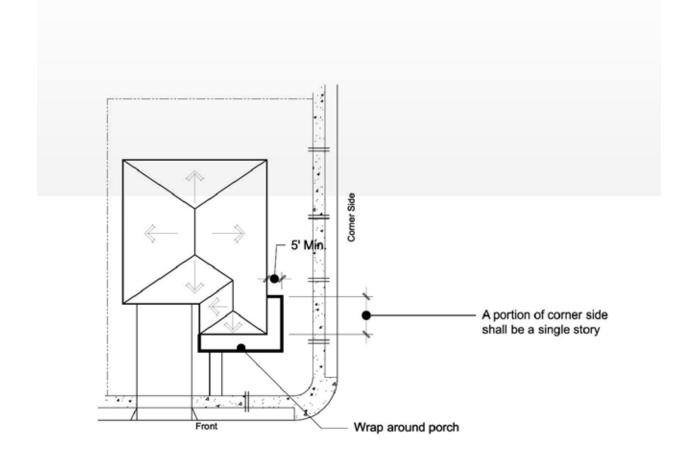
CORNER SIDE SINGLE STORY ARTICULATION
